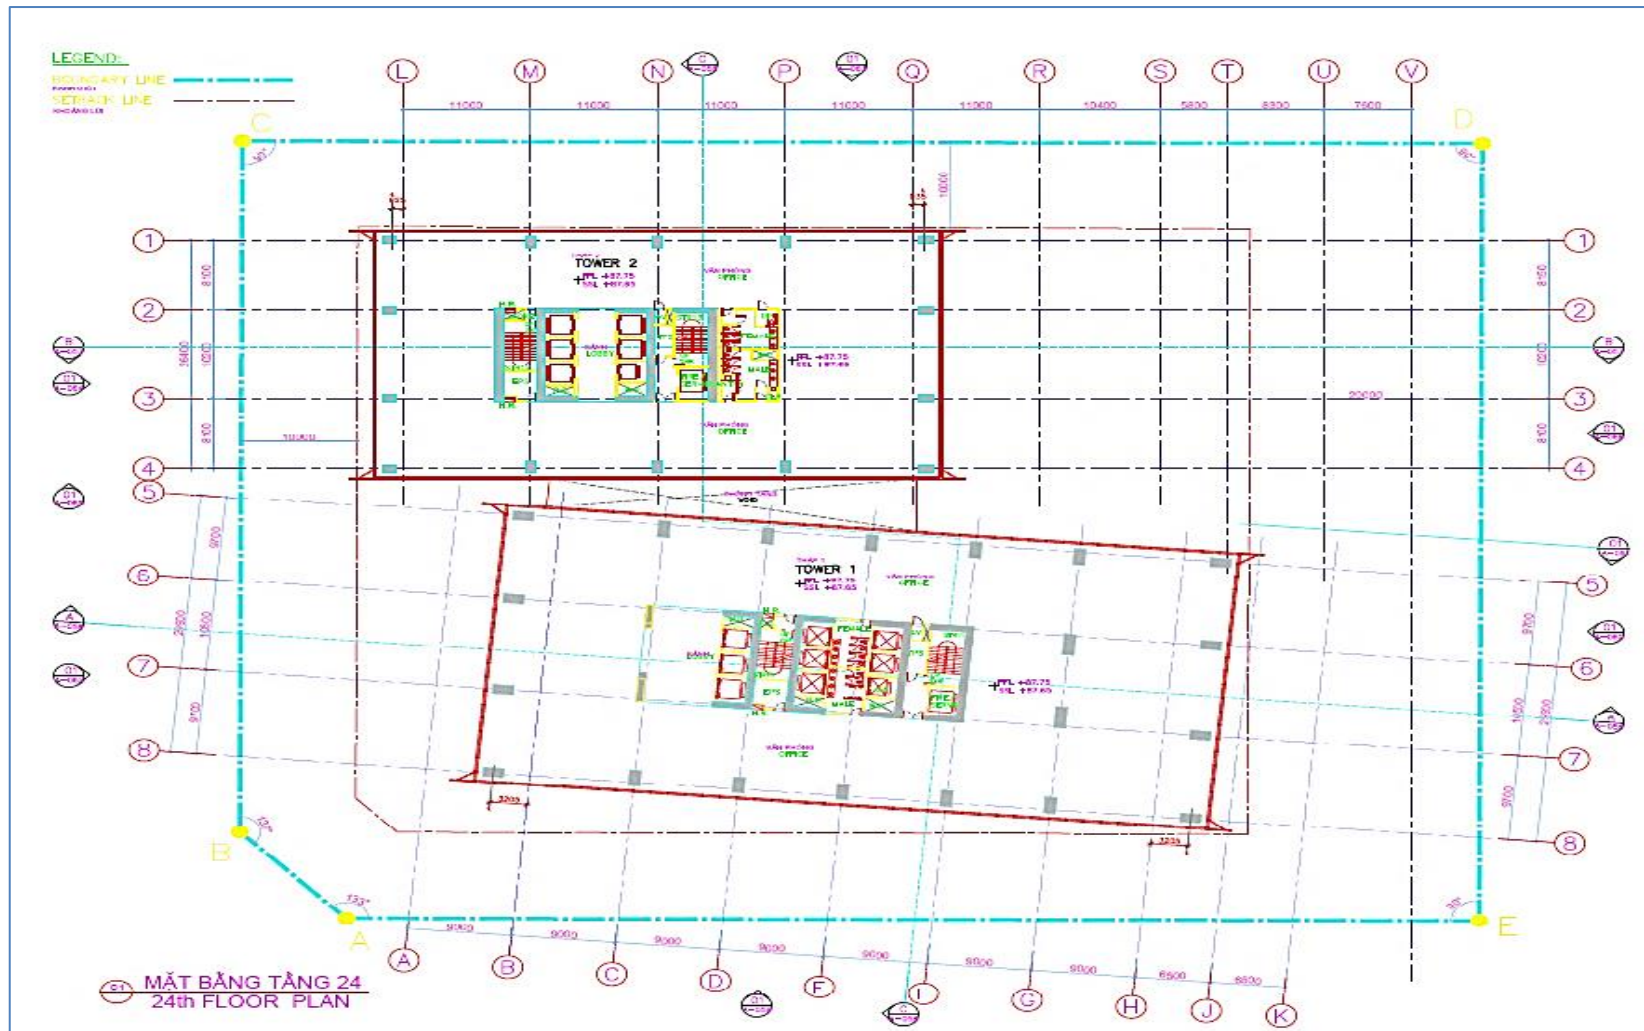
Typical separated floor slabs of 24, 28, 32, 36<sup>th</sup> floors
